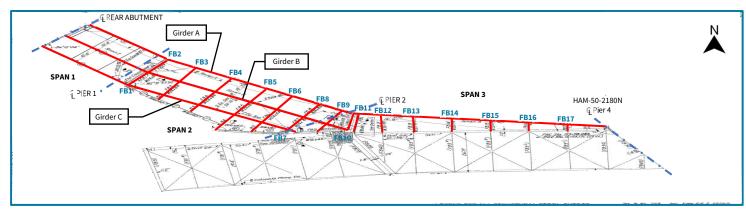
HAM-50-2181N Bridge Nomenclature (Framing Plan Layout and NSTMs – Spans 1 to 3)
